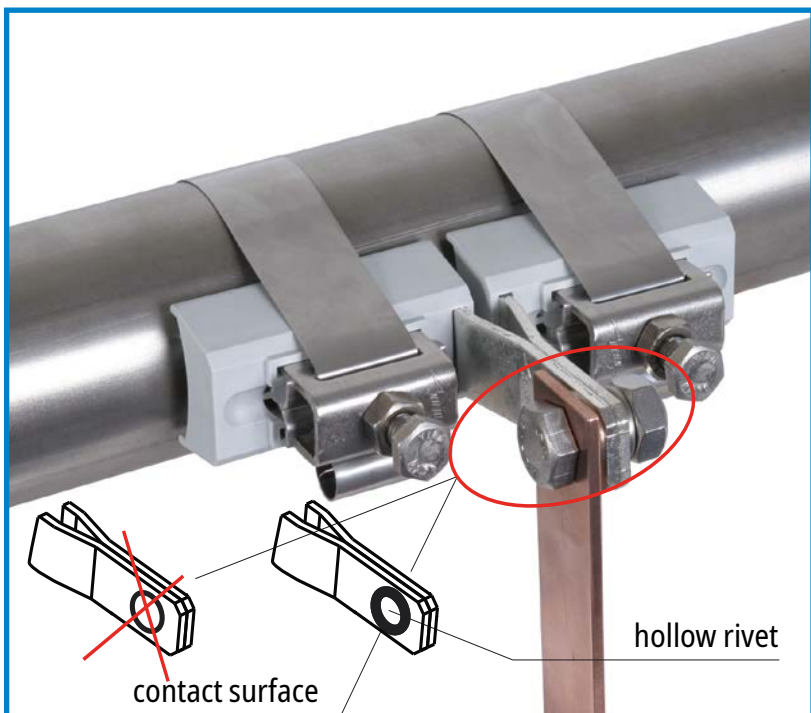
b Flat conductor with hole Ø10.5 mm
